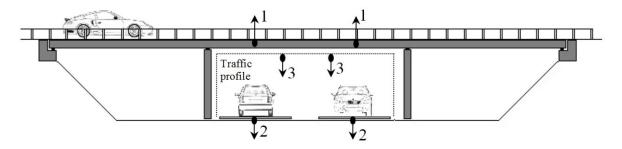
Replacement of an existing three span concrete plate bridge [Reitsema et al., 2015]
